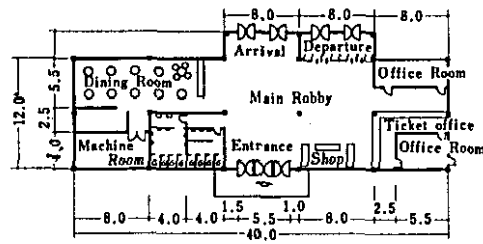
(2) Plan of Passenger Terminal (Domestic) (Unit . m)
